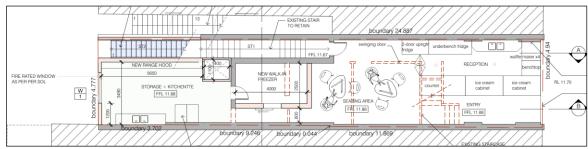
Proposed ground floor plan (source: Vivi building design, dated 13/12/2024)
